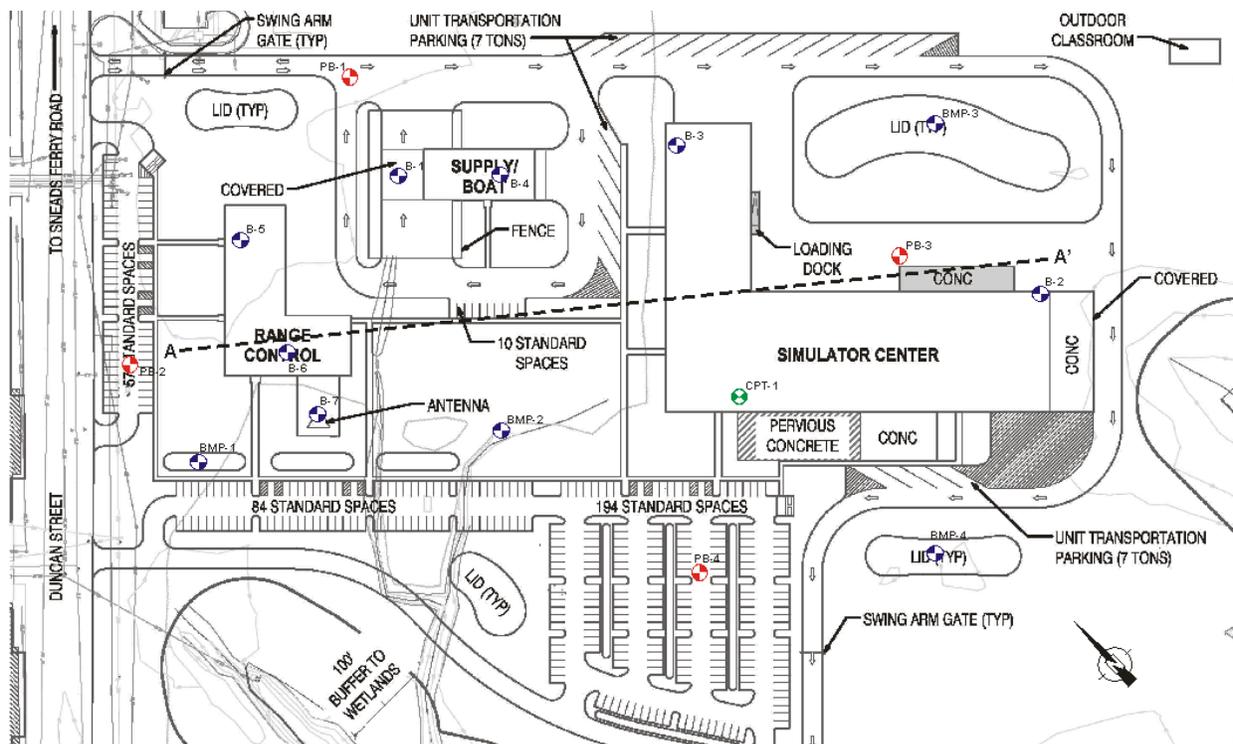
Testing Locations Relative to the Proposed Concept Plan
